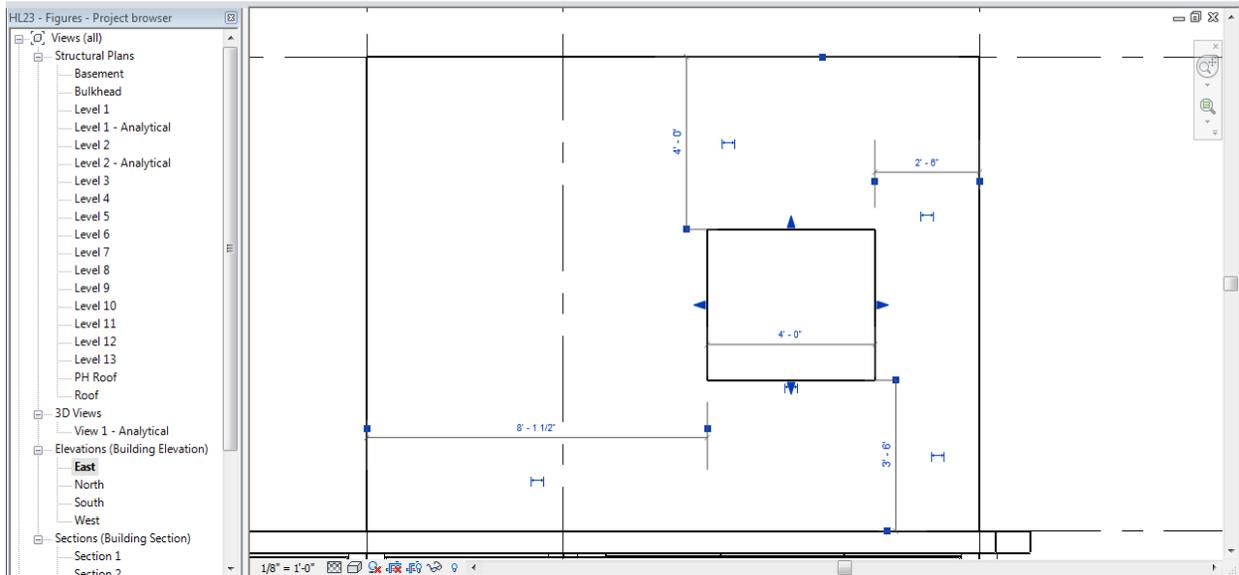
A Wall Elevation View Showing the Editable Dimensions of an Opening
